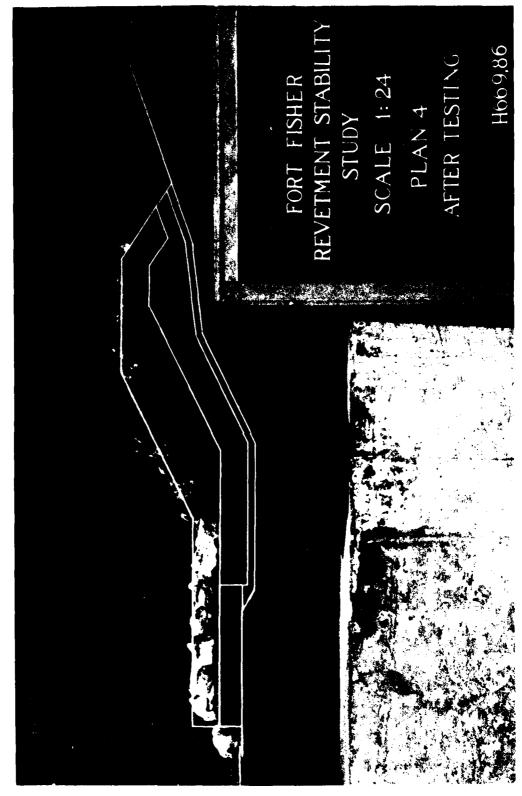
Side view of Plan 4 after testing Hydrographs A and C, high-water-level test
